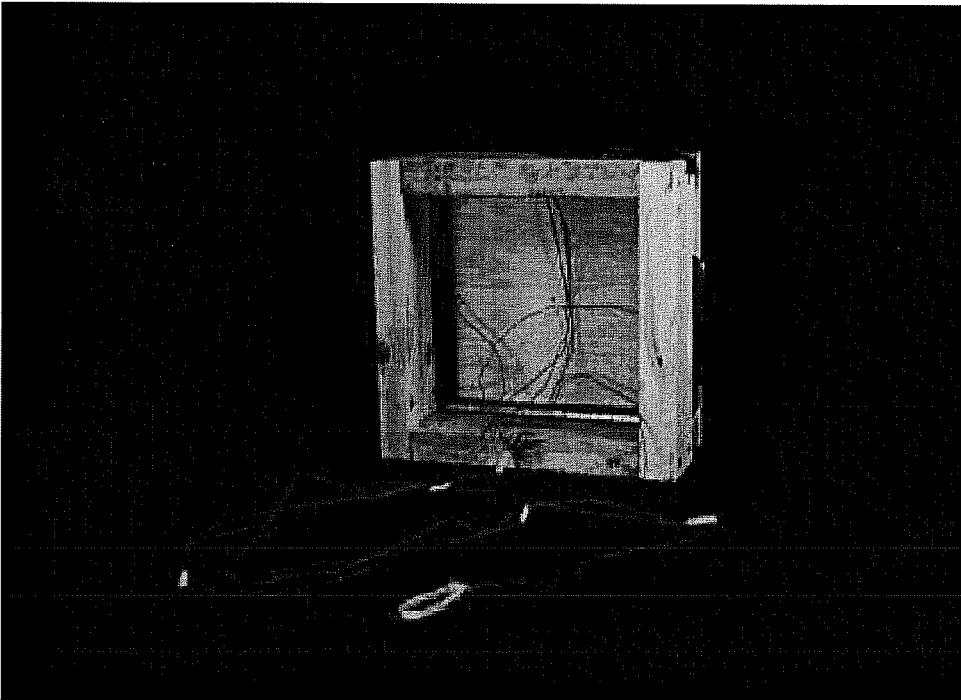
The formwork for the extended portion of the concrete core with the attached fishing line and embedment gages.
